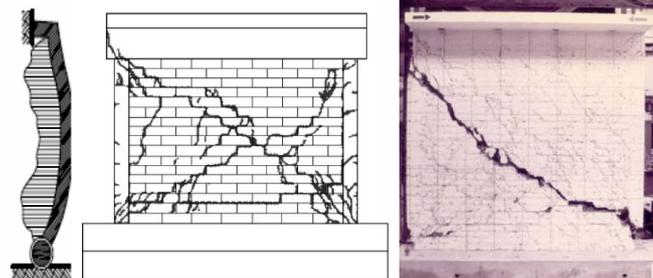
Shear Failure of Confined Masonry Walls
